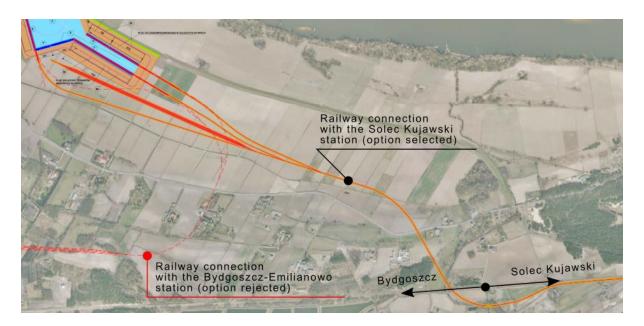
Planned access railways to the Bydgoszcz-Solec Kujawski Multimodal Platform
